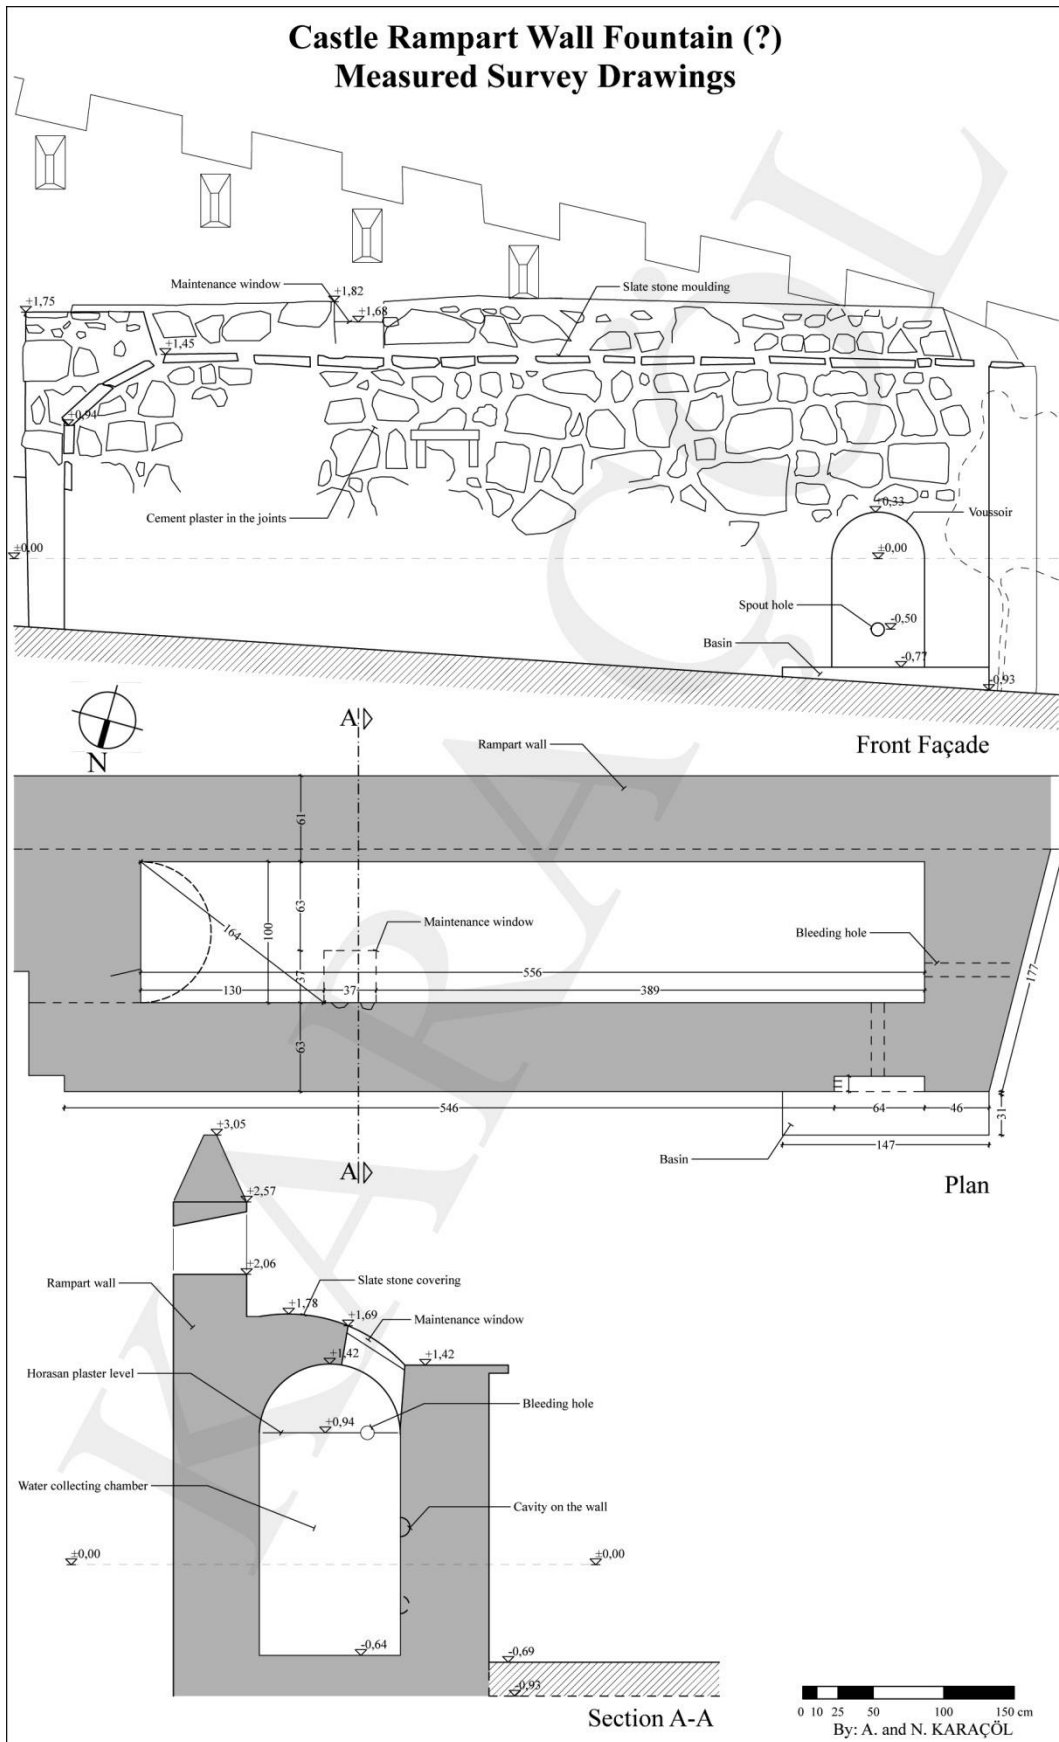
Castle Rampart Wall Fountain front façade, plan and section drawings
